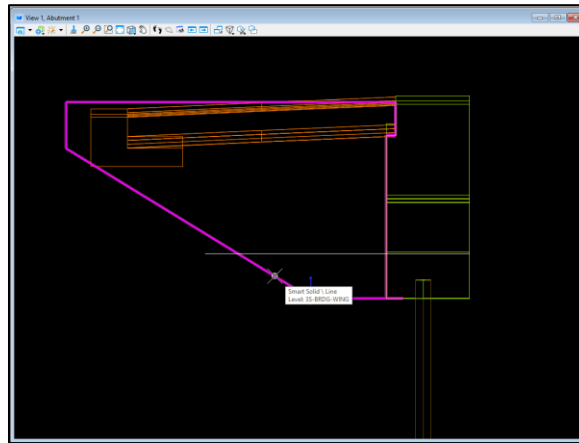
Cut Solids tool – Cutting profile selected
